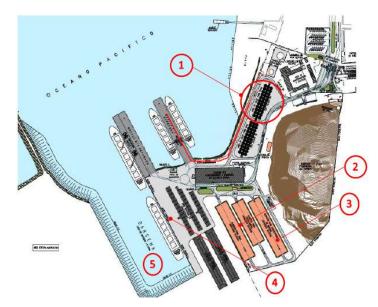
Port of Salaverry, Layout of the stages, and the new dock Source: Cassinelli (2018).
